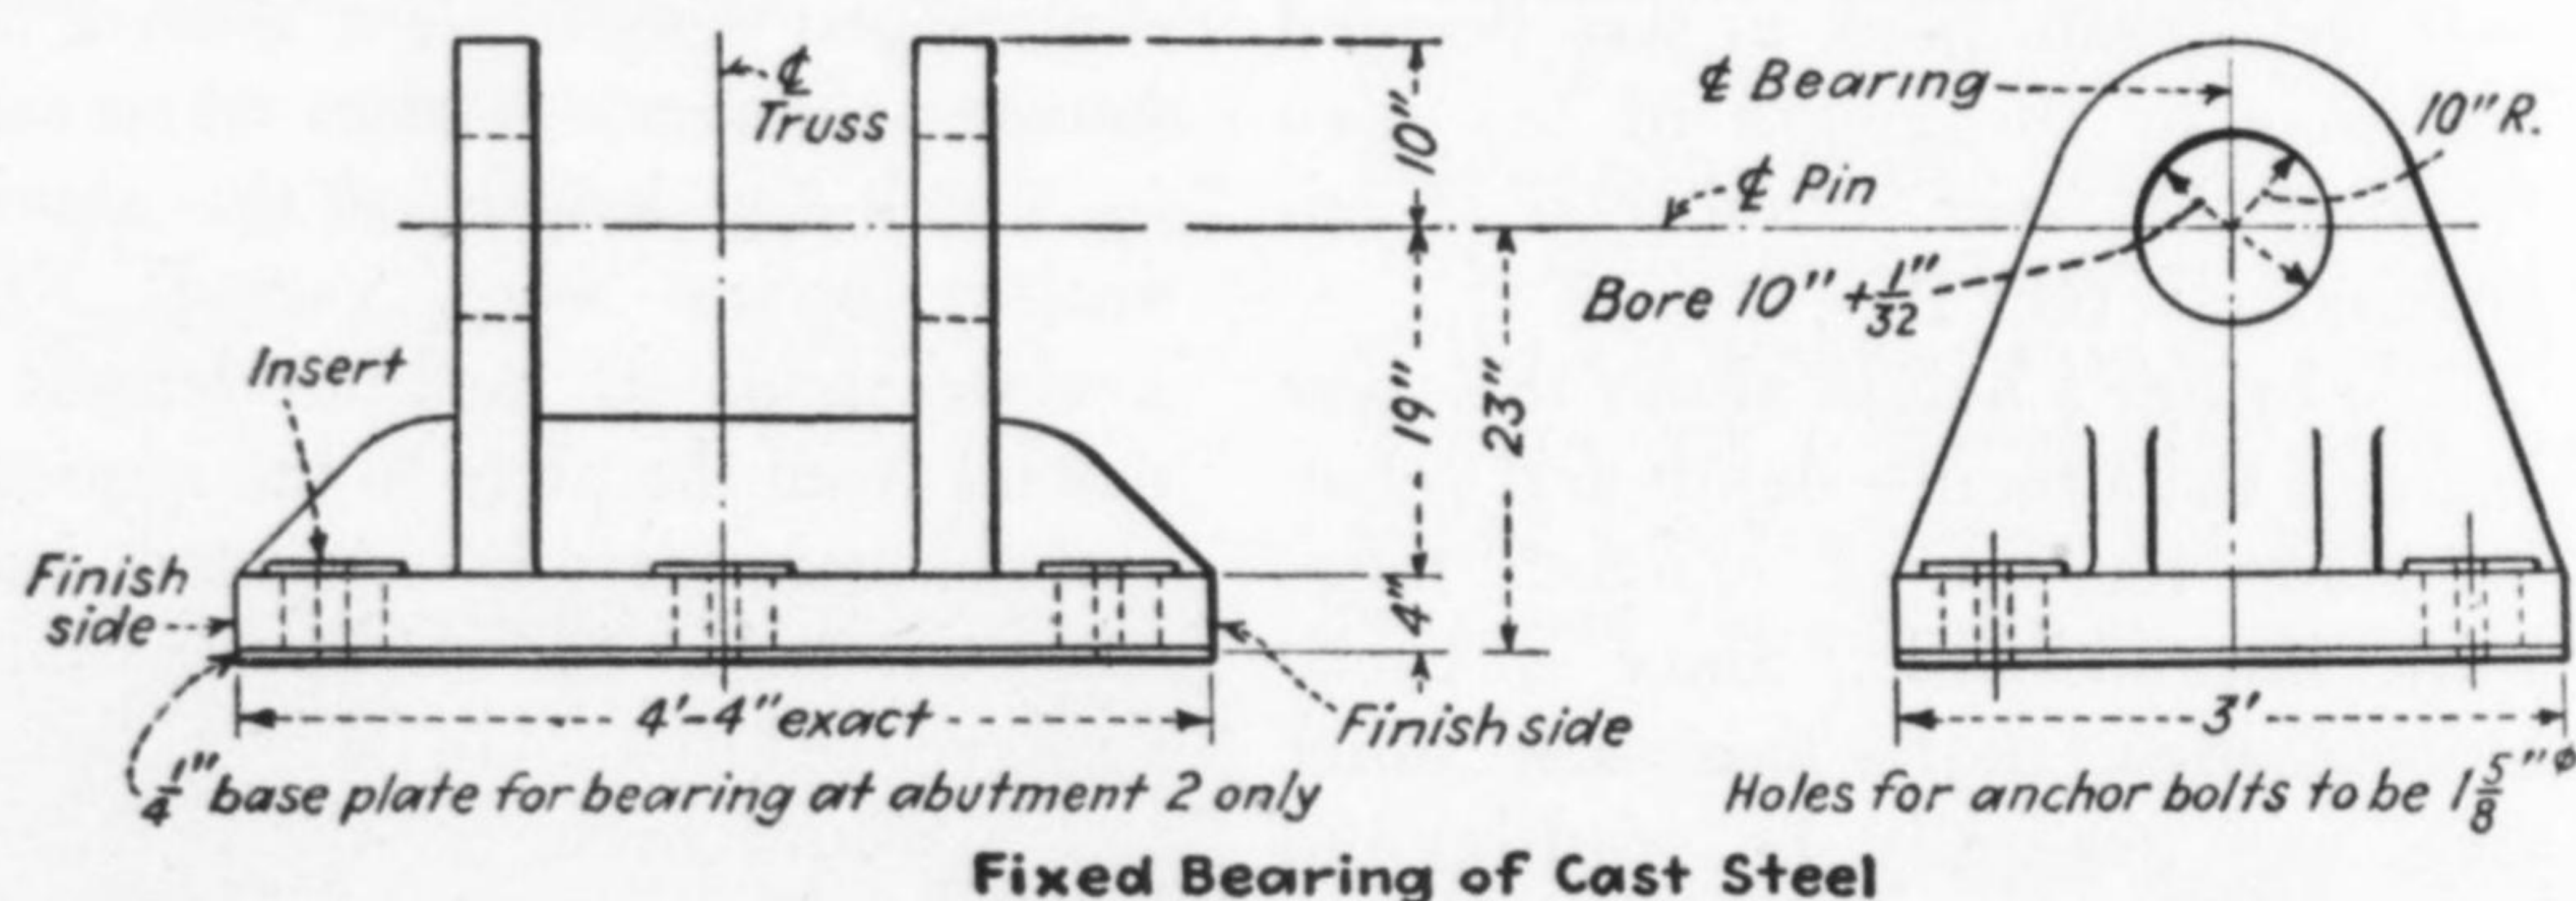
Details of bearings used at abutments. Fixed bearings are of cast steel and either cast or rolled steel inserts were allowed.
